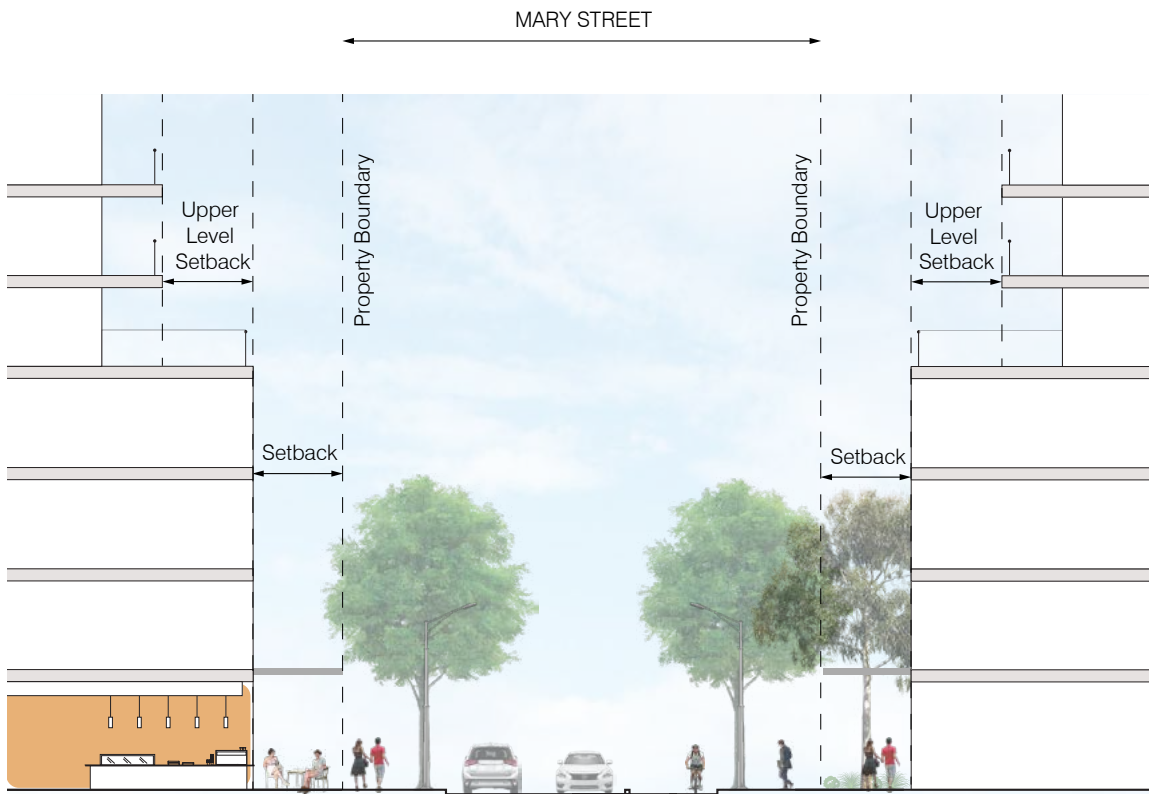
Section B - Illustration of potential typical section of Mary Street. This option illustrated built form interface to the street and two-way traffic
